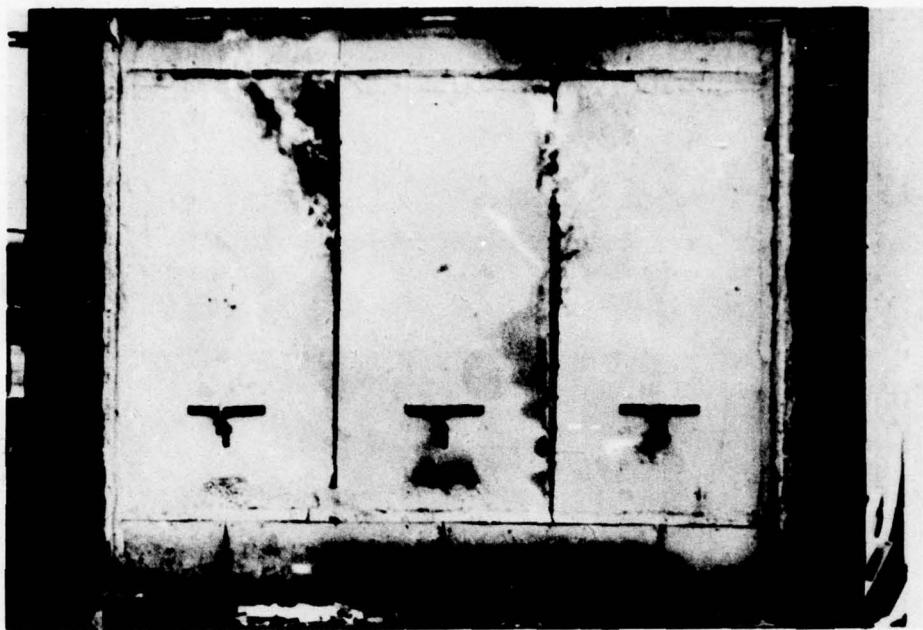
(a) Exposed face of the wall specimen shown in Figures A5 and A6 after the 1-hour fire exposure. Note that the gypsum wallboard is still in place.
